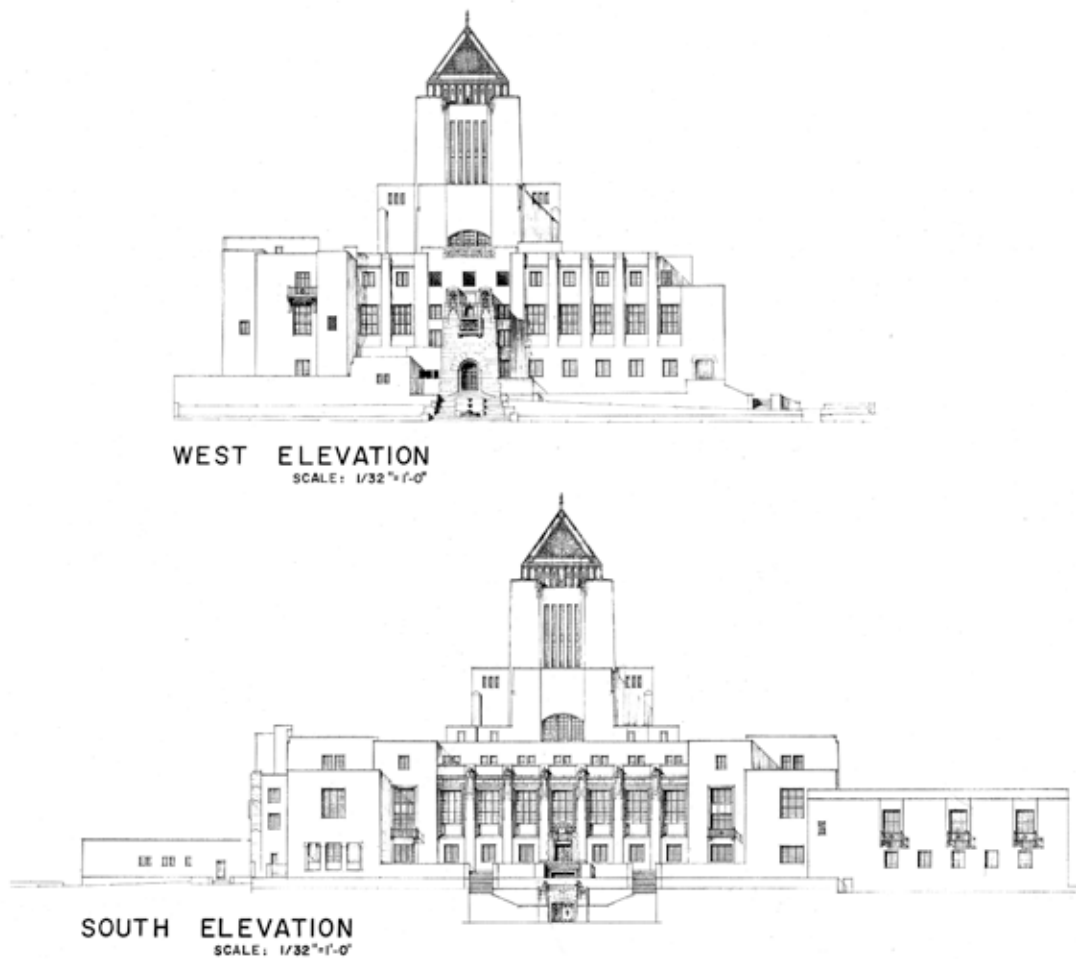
Elevations of Los Angeles Public Library. Historic American Buildings Survey.
